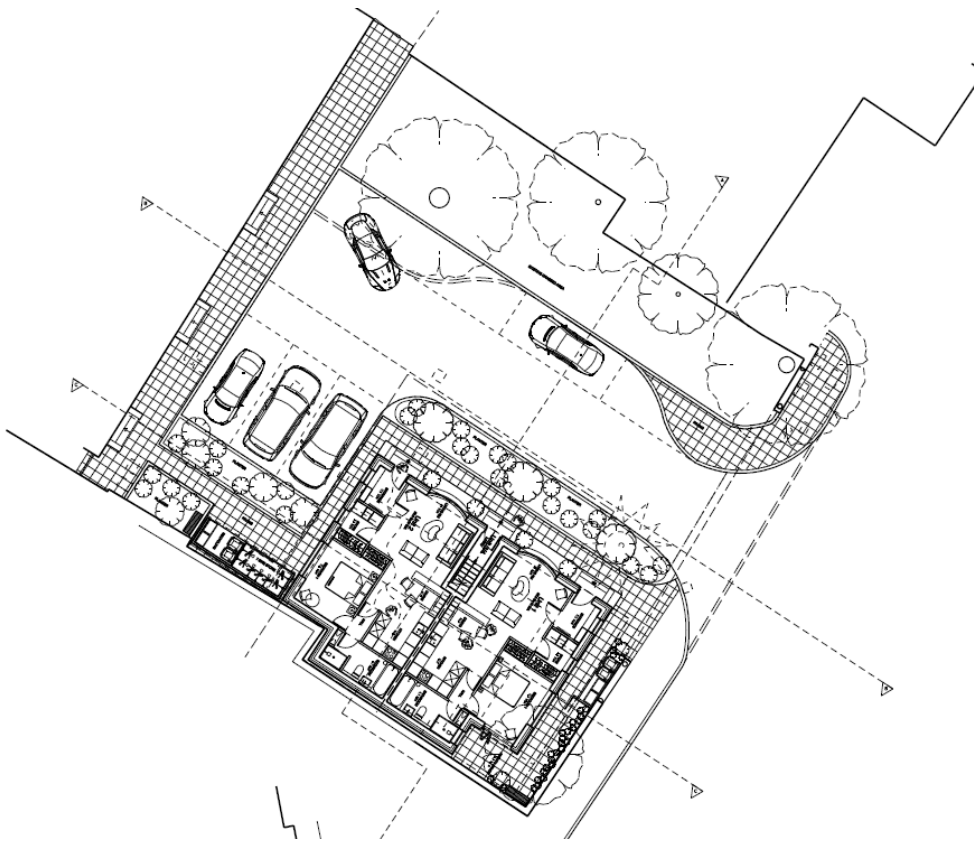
// The proposed site plan with new footprint, parking, and landscaping arrangements for reference
